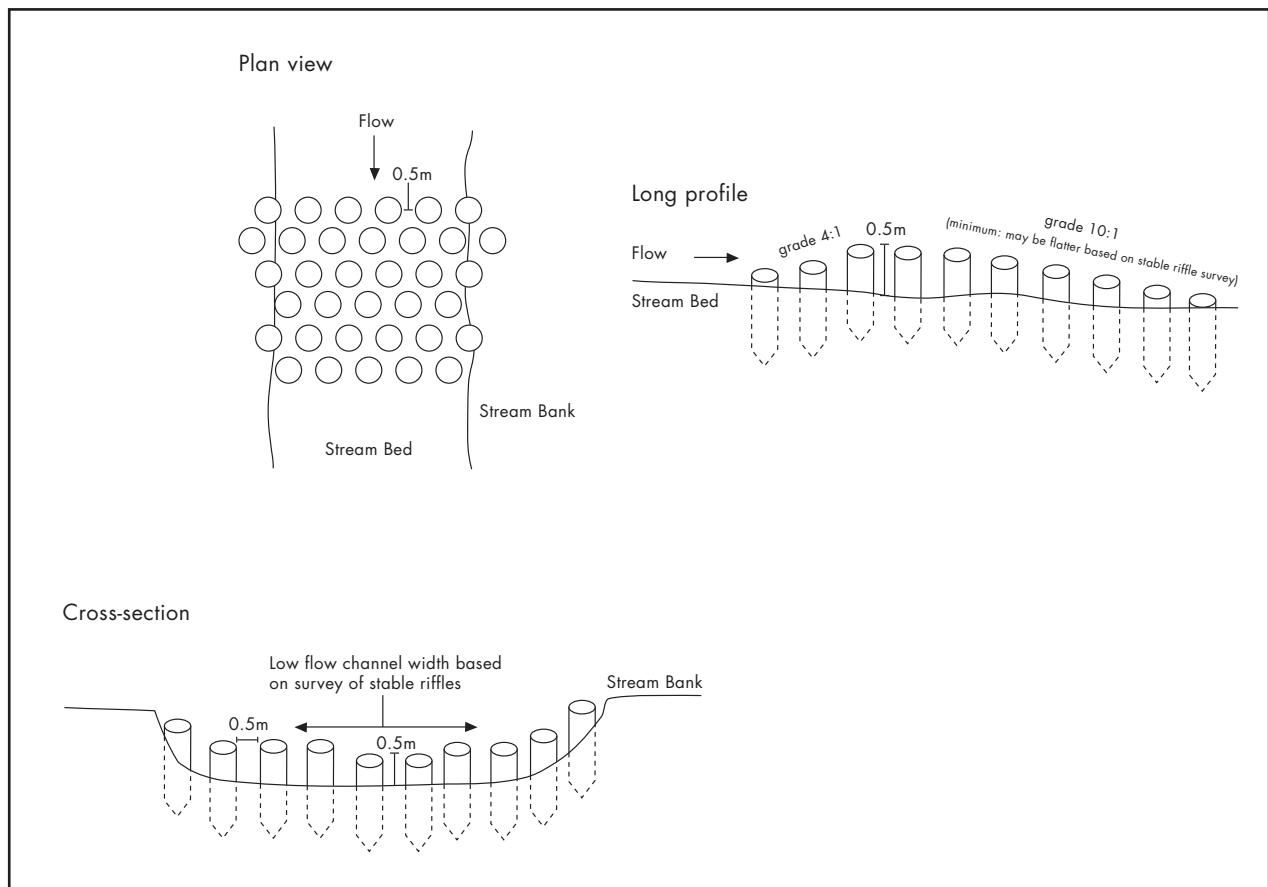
Design details of trial vertical pin ramps (design from Allan Raine).
